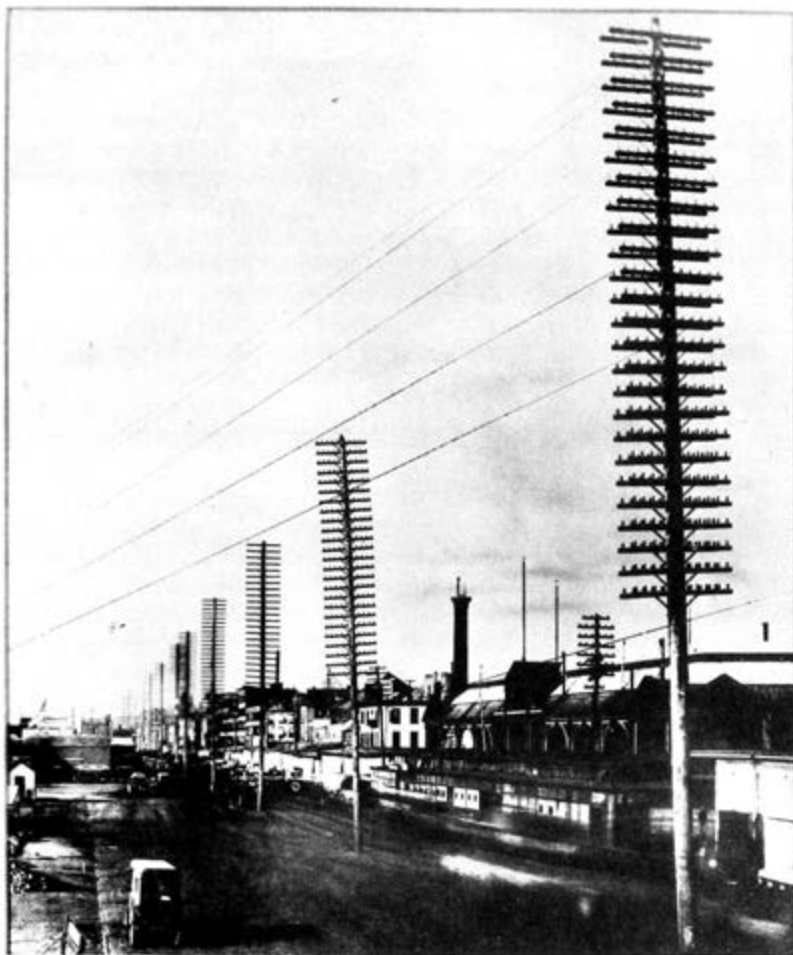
West Street pole line in New York City, erected in 1887, with 90-foot poles, each carrying 25 crossarms and 250 wires. At some points the poles carried 30 crossarms and 300 wires. Picture taken at foot of Cortlandt Street.
